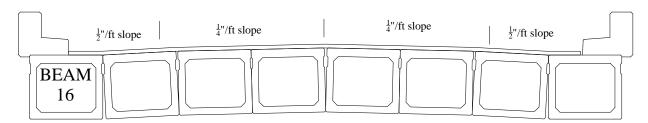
Location of Beam 16 in Section of Lakeview Drive Bridge
